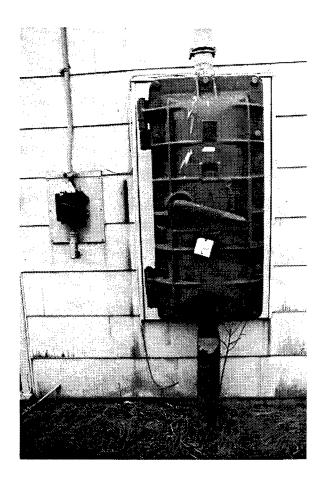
Building 6706-2: Explosion-proof light switch mounted on the east wall of the Pump and Heater House.
